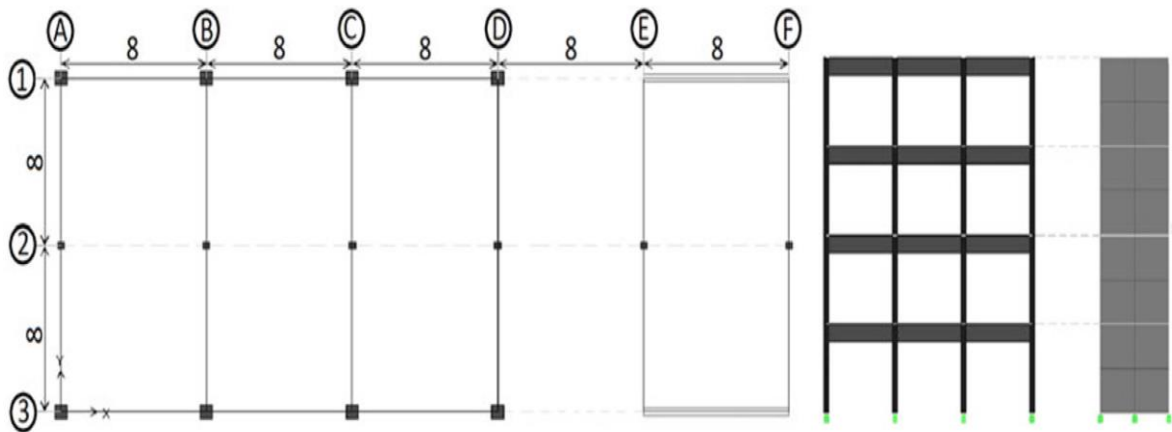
Plan and Elevation of The RC Wall-Frame Models. [12]
